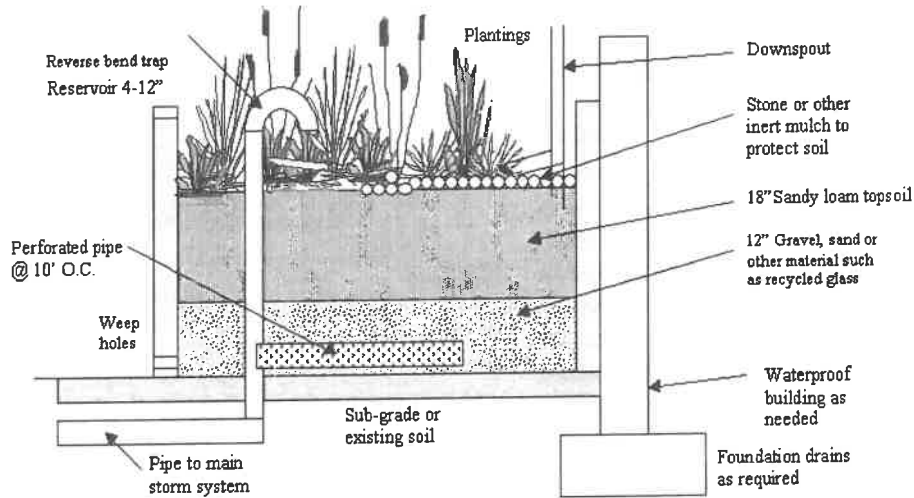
Stormwater Planter Box Biofiltration System.
